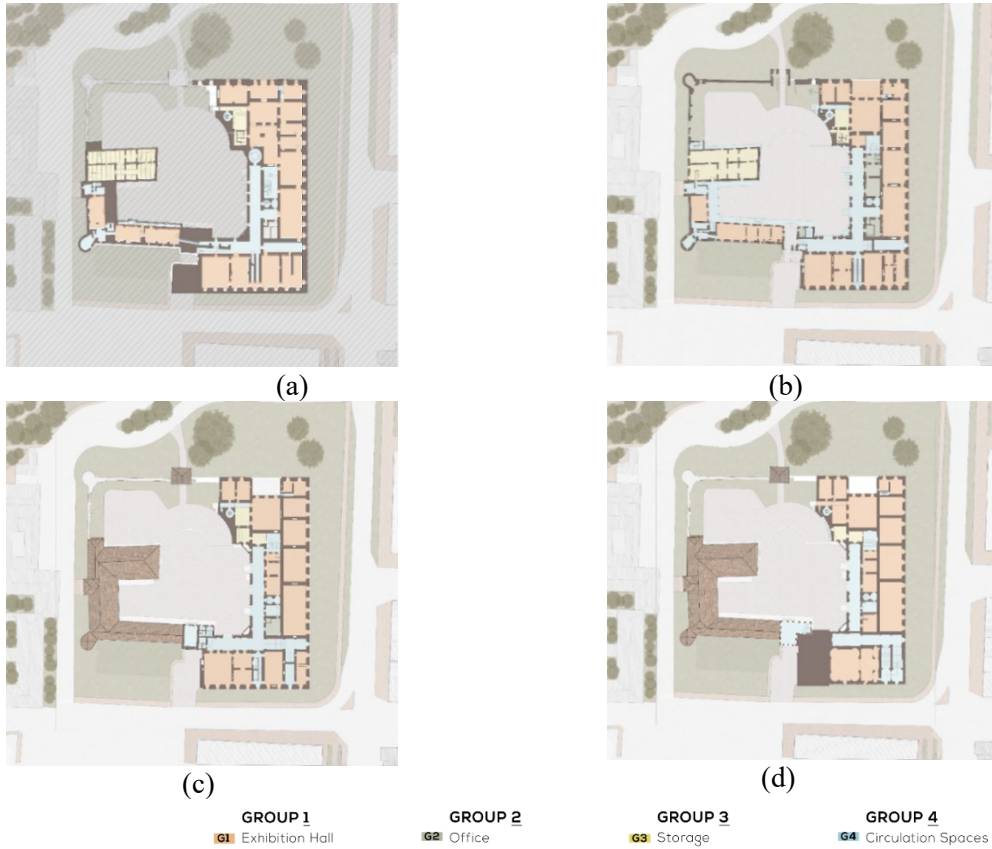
Floor plans of Palazzo Farnese [(a) Underground FL (b) Ground FL (c) First FL (d) Second FL]
